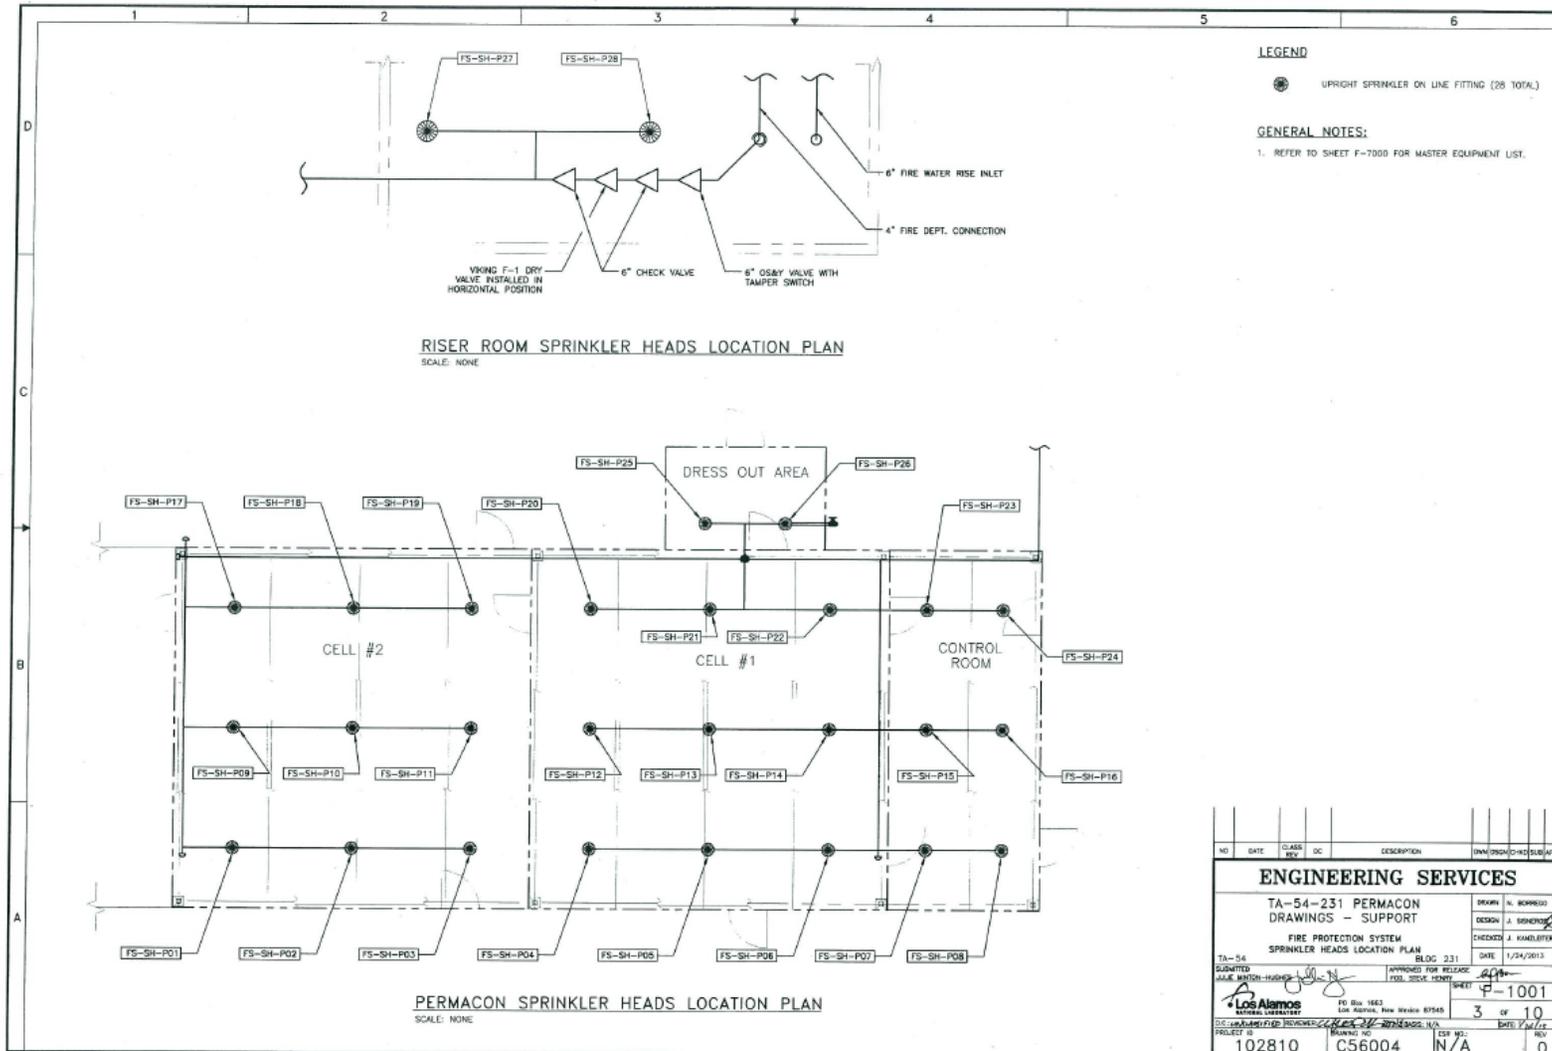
, TA-54-231 PermaCon Sprinkler Heads Location Plan
